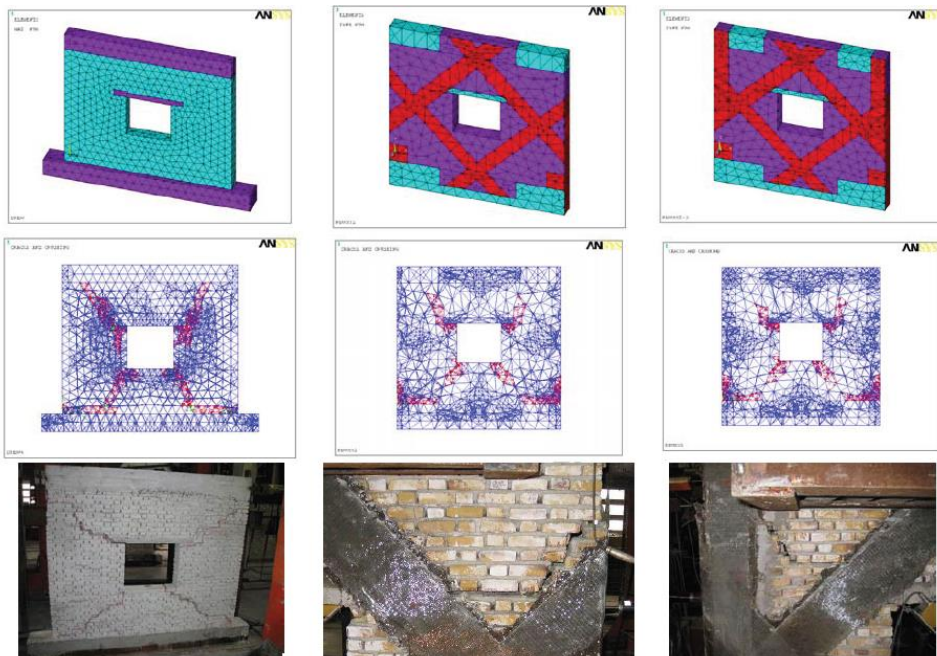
Result of finite element model and cracking pattern of the test walls [46]
